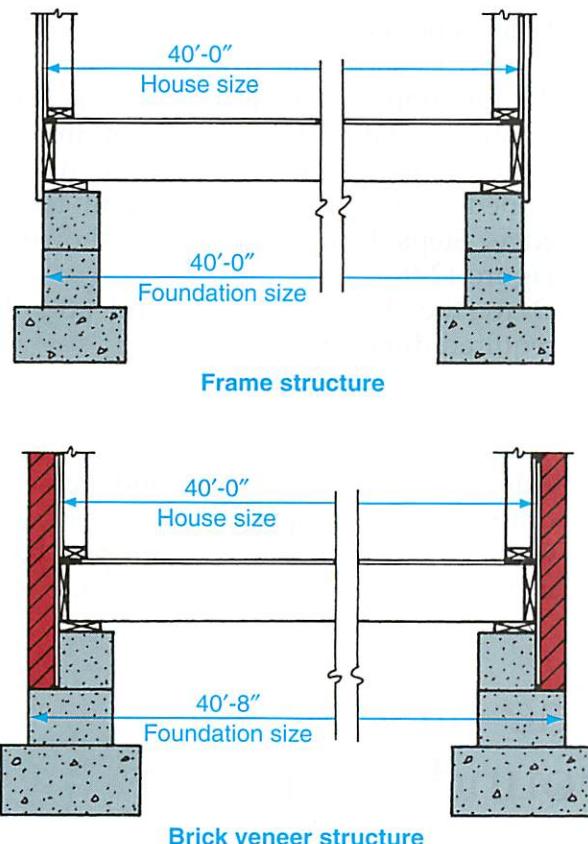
A brick veneer house requires a foundation wall 8" longer and wider than if the same house is a stud wall structure.
